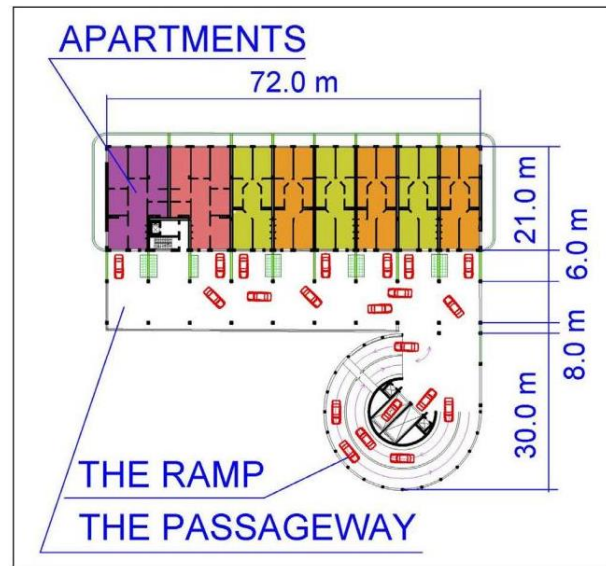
A variant of the linear layout of the house with individual Parking lots in front of the entrances to the apartments (circular car ramp at the end) – a typical floor plan
